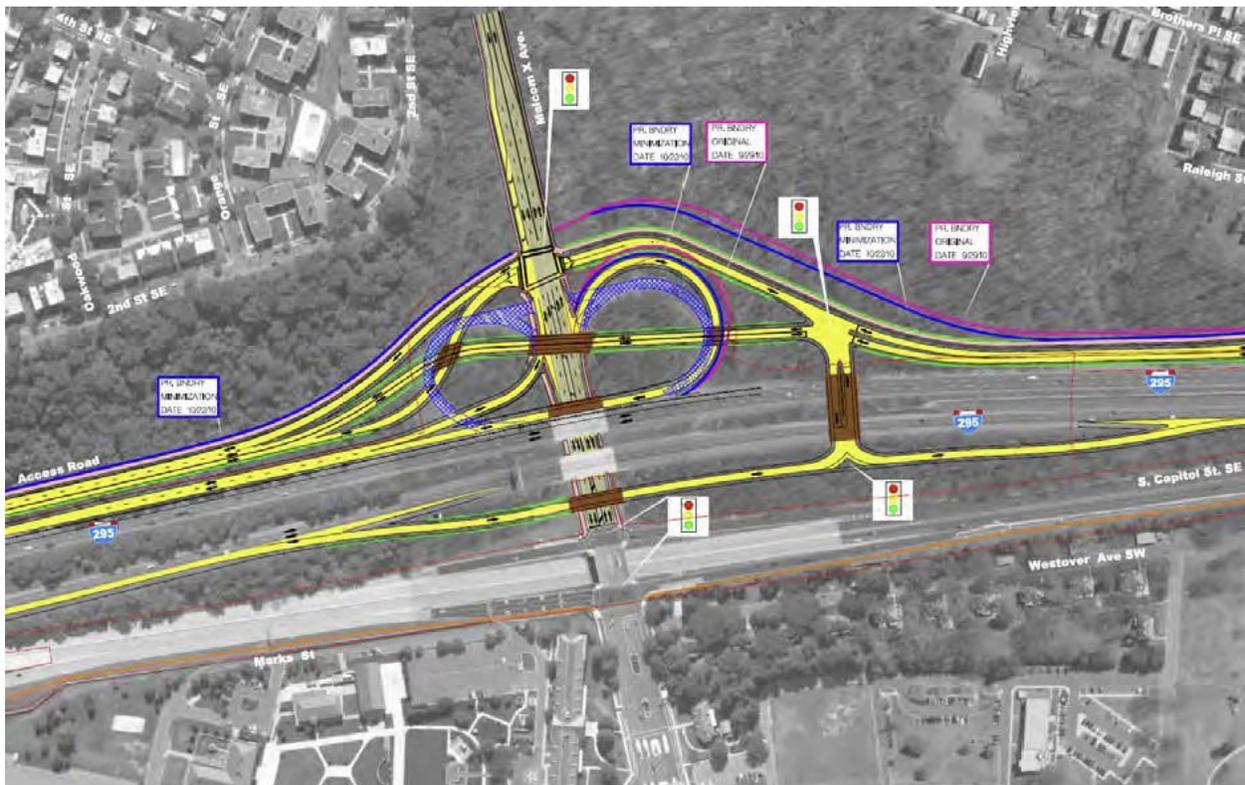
Shepherd Parkway – Detail of Malcolm X Avenue and Access Road Intersection
